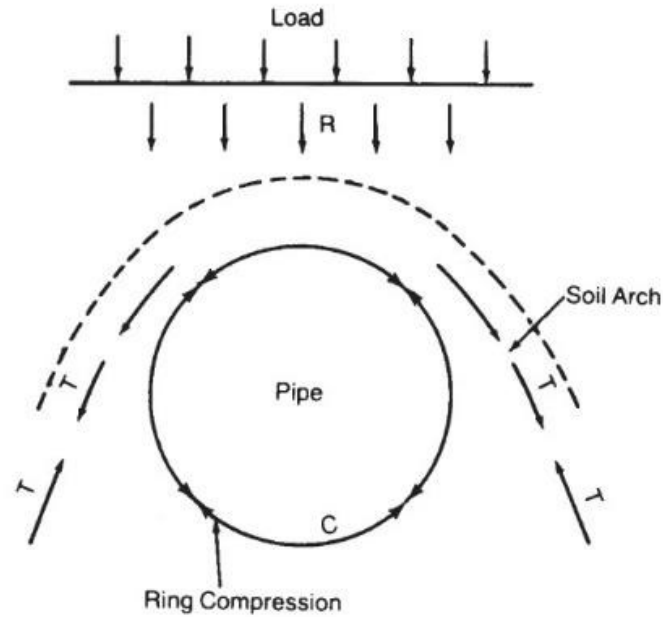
Soil arching over flexible pipe (Corrugated Steel Pipe Institute, 2009).
